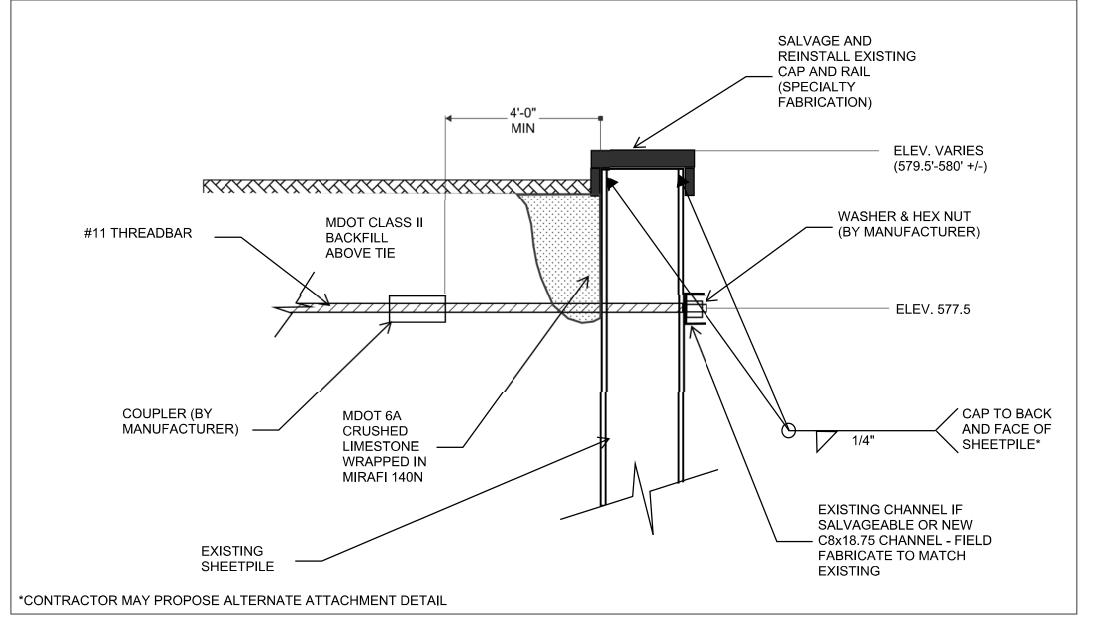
SECTION - SHEETPILE/TIE CONNECTION
